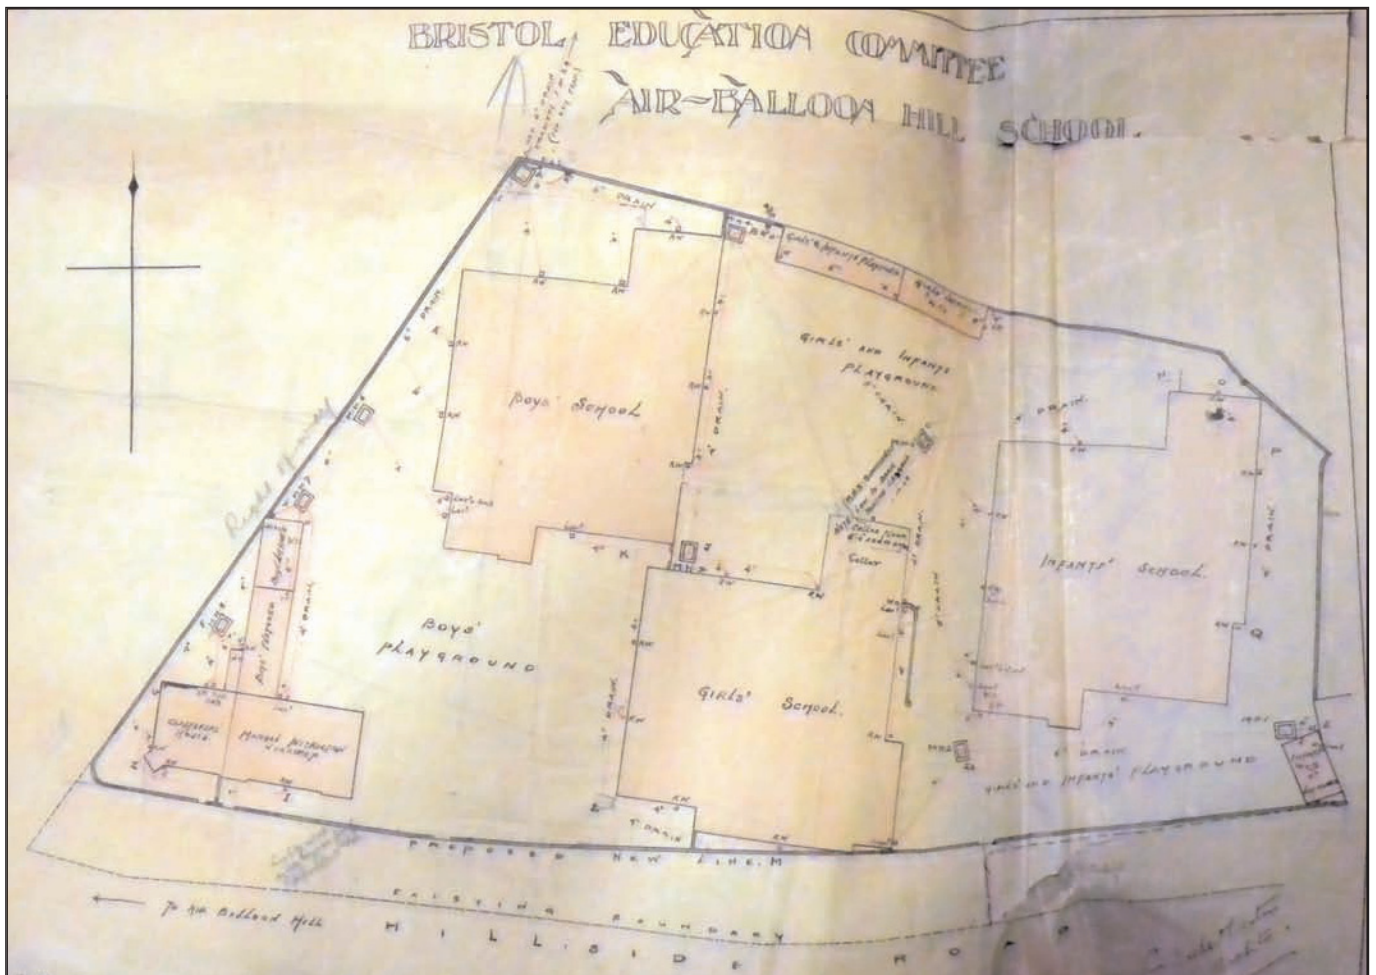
Architects' drawing dated 1903 showing layout of buildings and drainage within school precinct (BRO) Building Plan Book Vol.44 Folio 64
